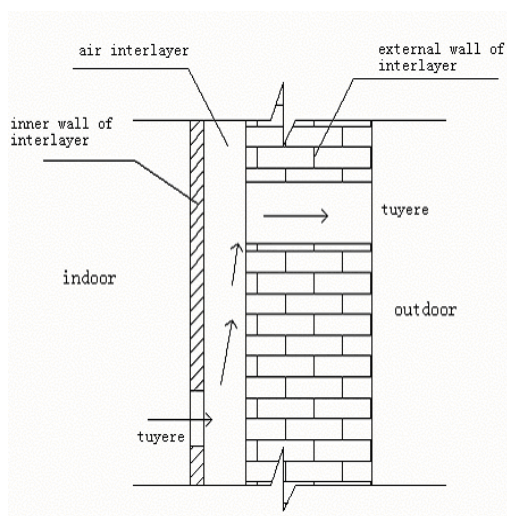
A Kind of New Wall of Central Air Conditioning System
